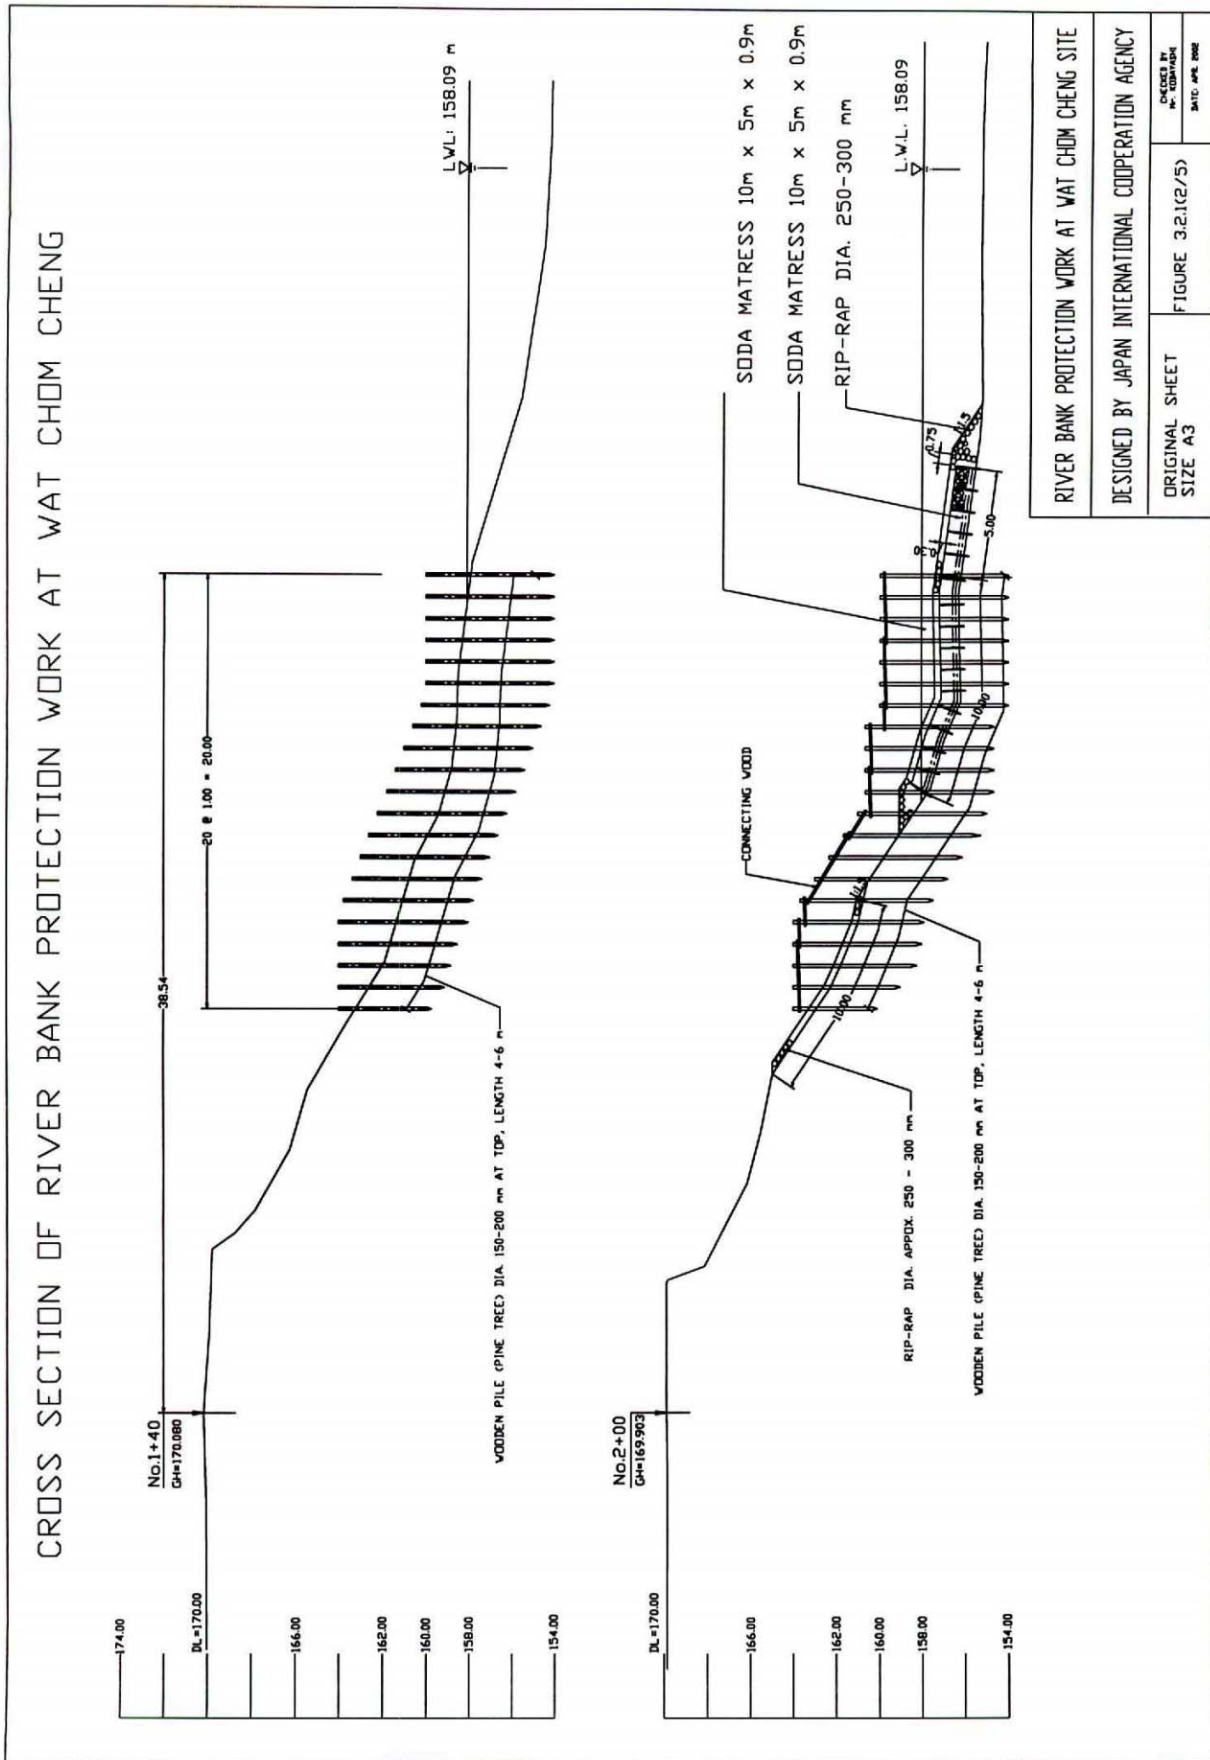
(1/3) Cross Section of River Bank Protection Work at Wat Chom Cheng Site
